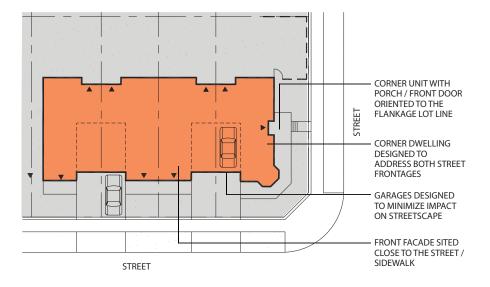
Conceptual siting of street townhouses and corner treatment considerations.
